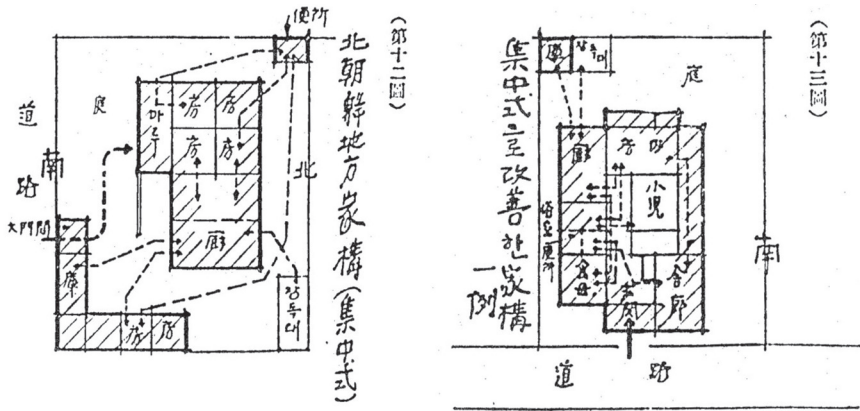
Park Gilryong, A Study of House Layout about “Centralized Housing Plan.”
